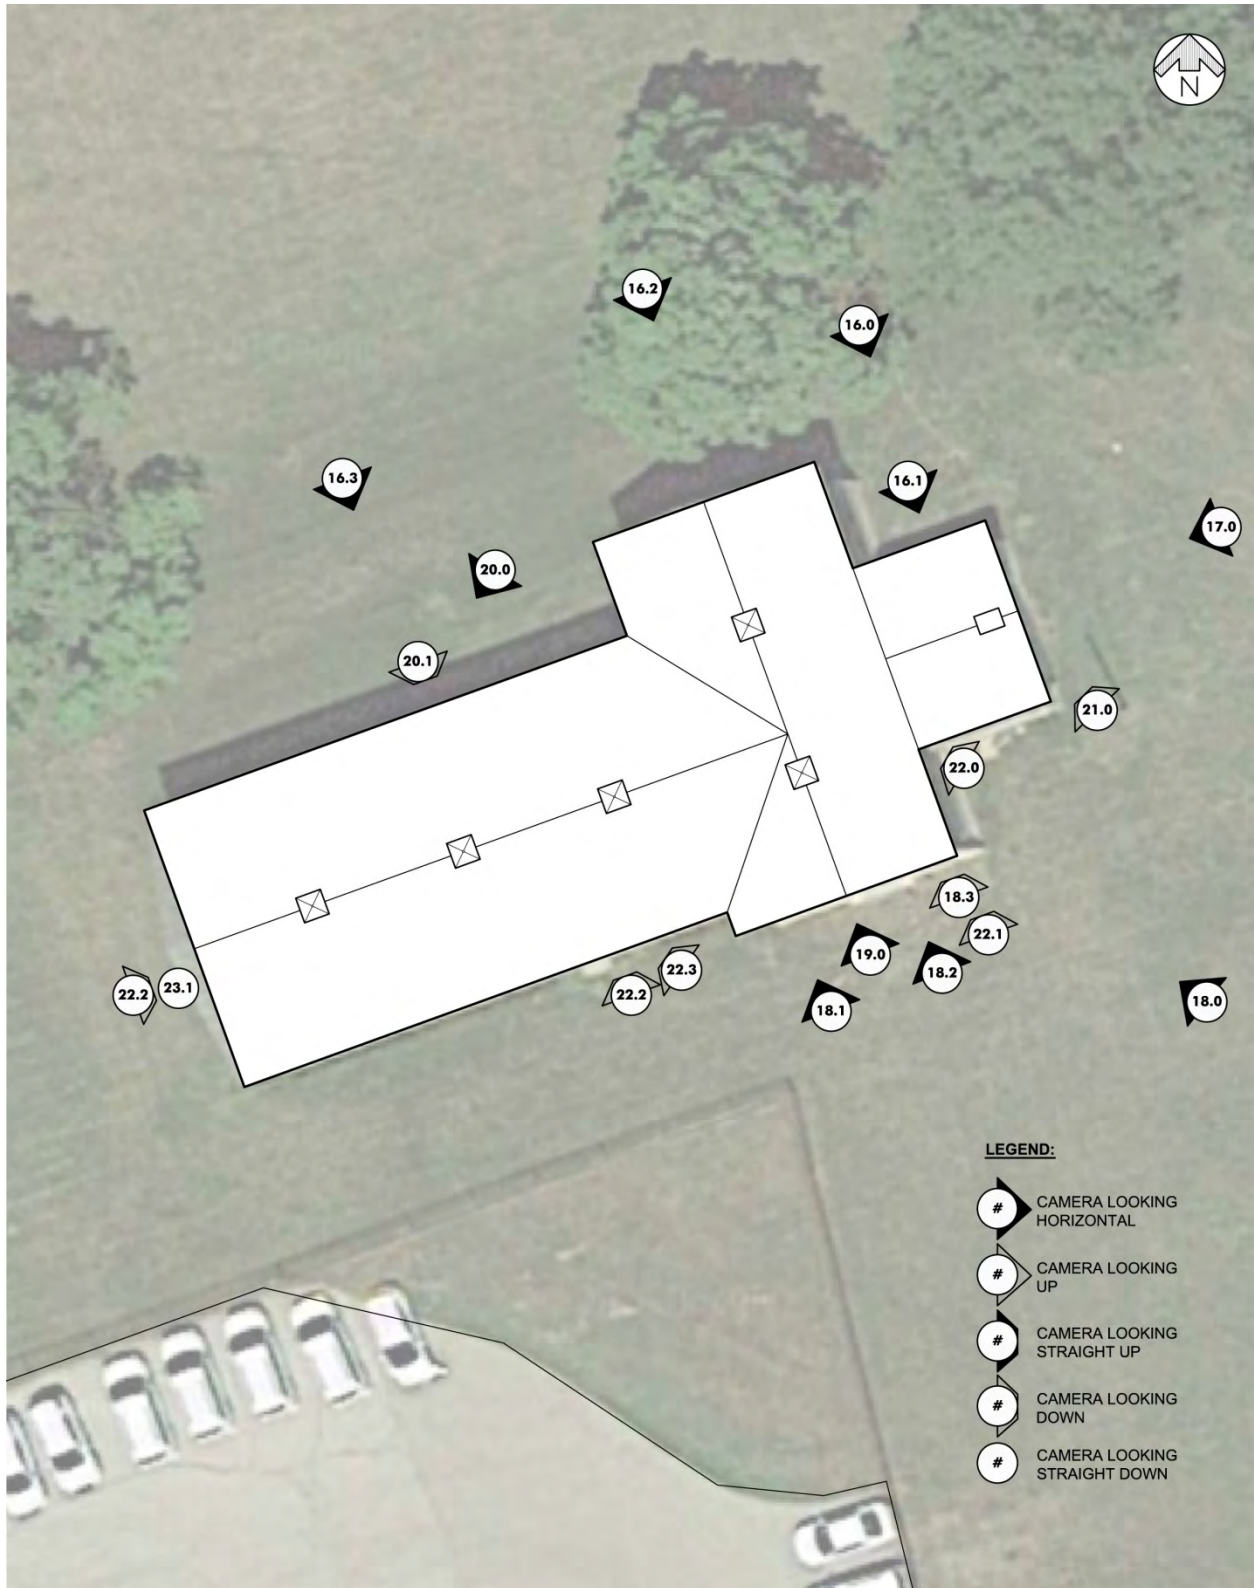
Photo No. 16.0 – 23.1 (Walls Above Grade and Foundations)
